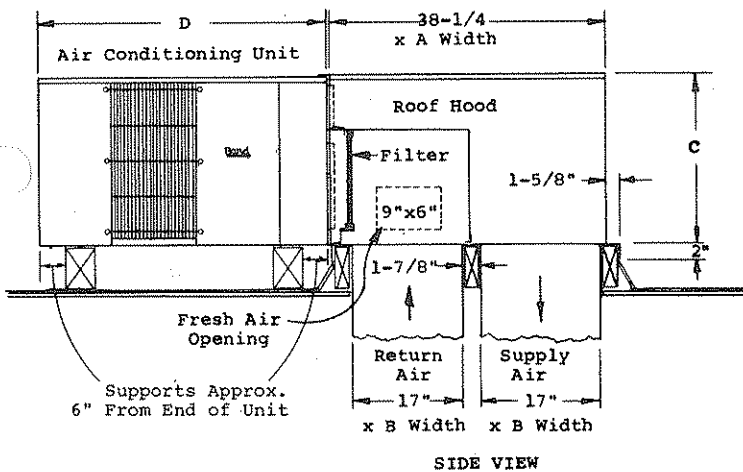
UNIT AND ROOF HOOD DETAILS
